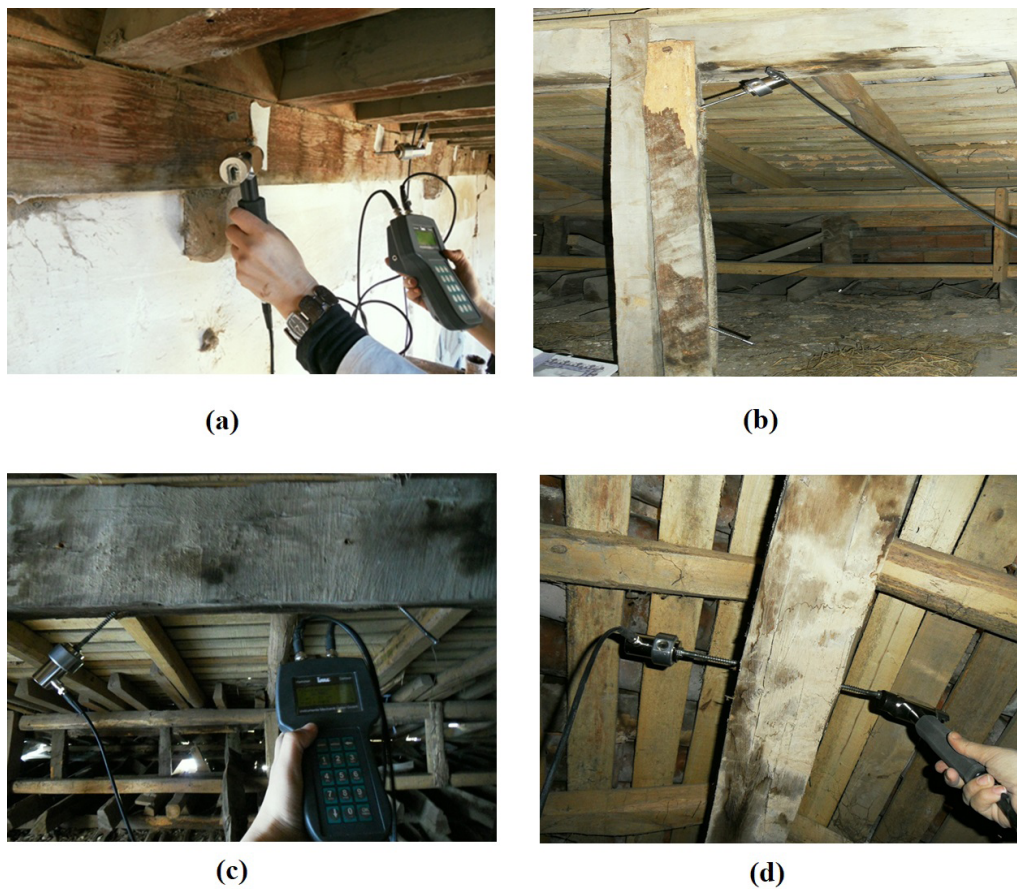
WS measurement in a) wood beam, b), c) and d) truss.
